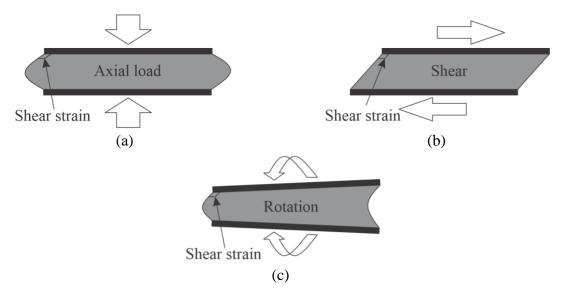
Shear strain in bearing pad due to: (a) axial load; (b) shear; (c) rotation
